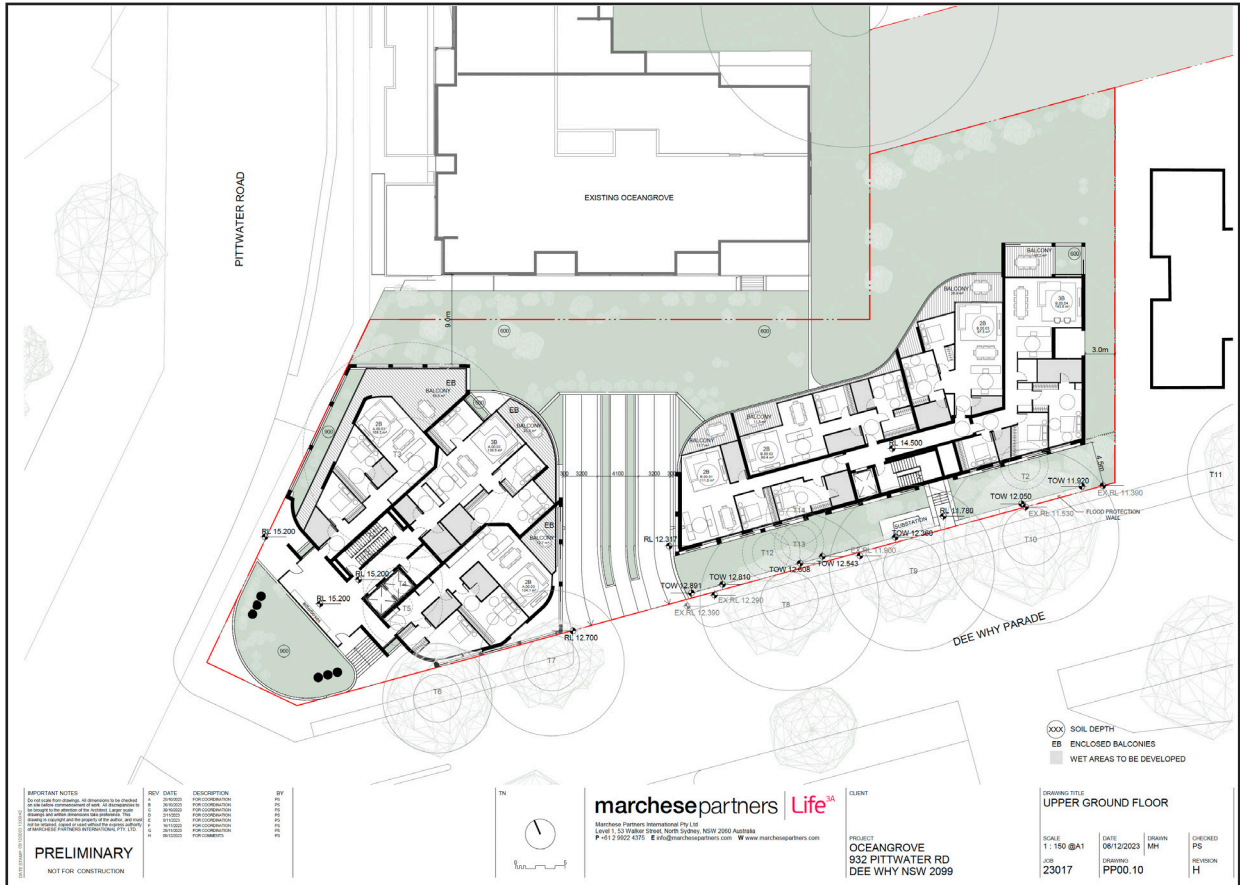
Ground floor plan of proposed design by Marchese Partners.
